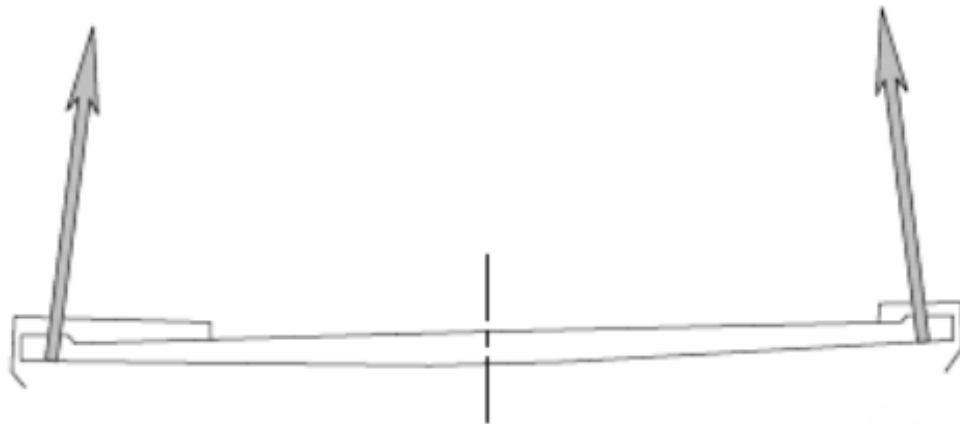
Typical Connection between Side deck cables and solid slab section
